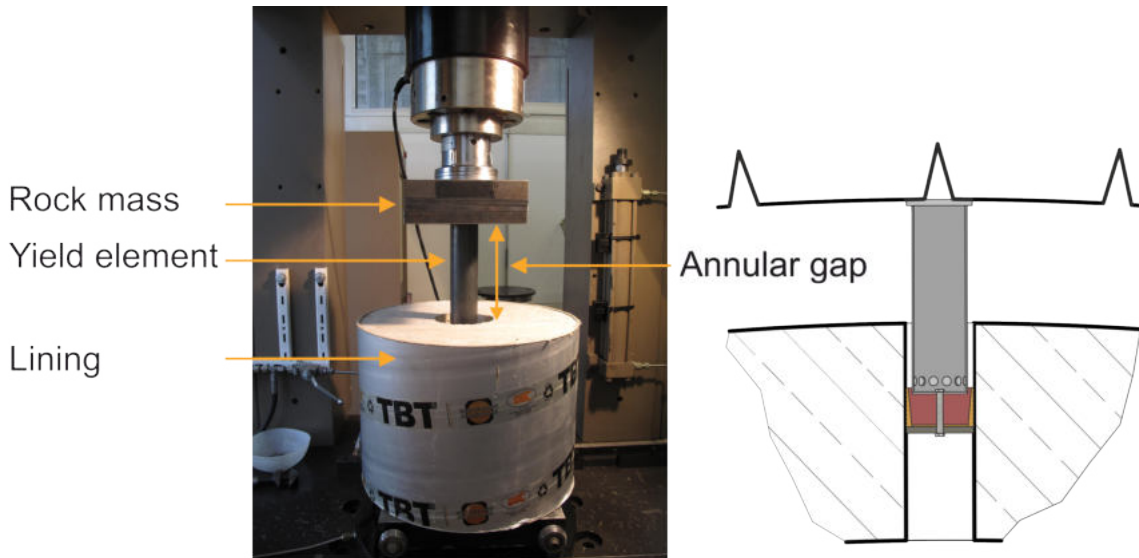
Test arrangement of a yielding element in a servohydraulic test facility.
